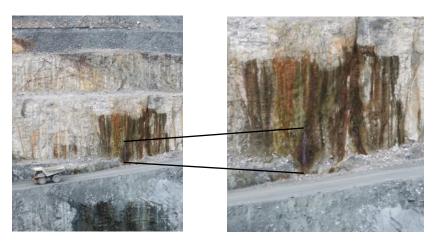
Seepage in the south wall of the Bay-Goose pit.
